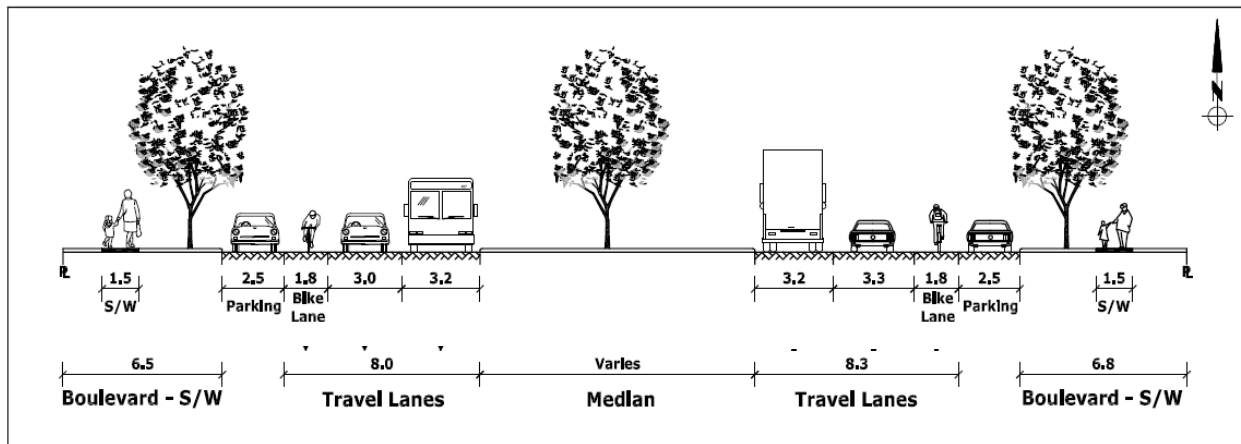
49<sup>th</sup> Ave to King Edward Avenue - Bike Lanes with Full-time Parking
